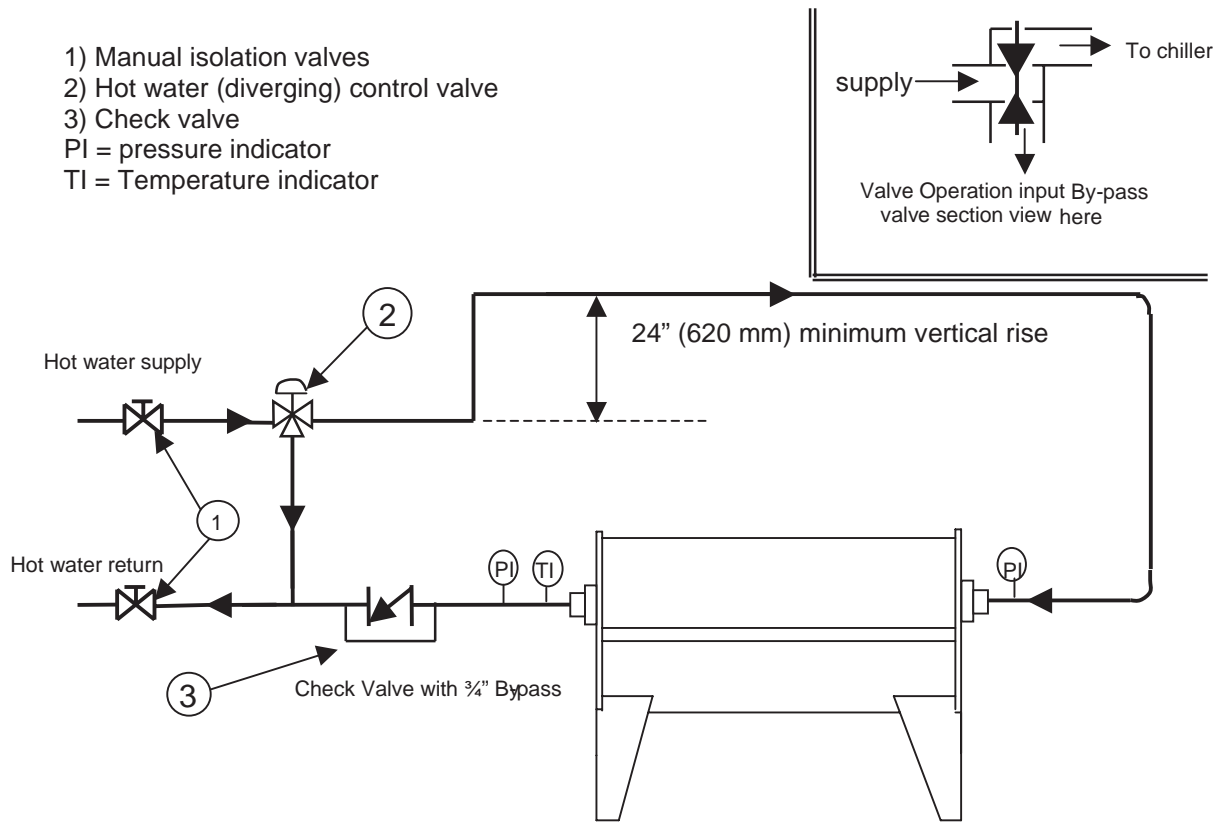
TYPICAL 3-WAY DIVERGING CONTROL VALVE ARRANGEMENT
